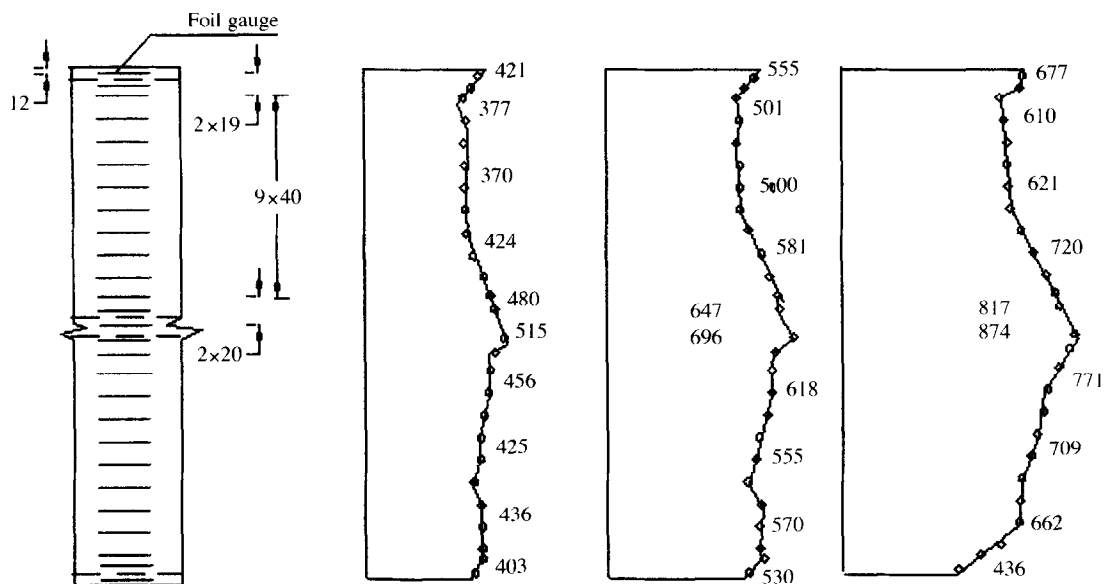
Distribution of strains in flange of roof panel  $A_3$ .
